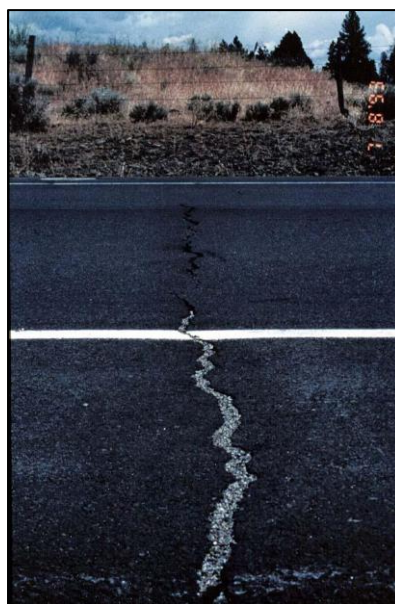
Transverse cracking (www.pavementinteractive.org)
